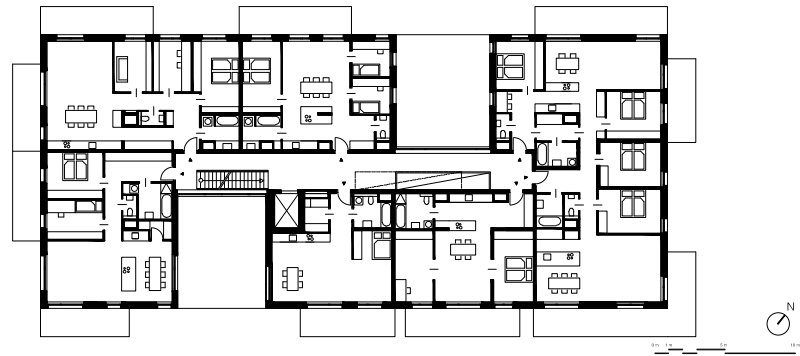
Floor plans (Einszueins Arch.Office Documents)
